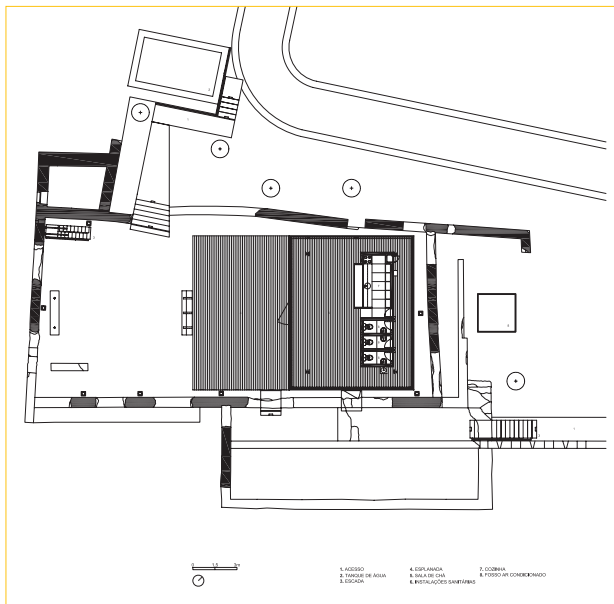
Plan of the Tea House with external arrangements and drawings of the ruins of the “Paço das Infantas”.
